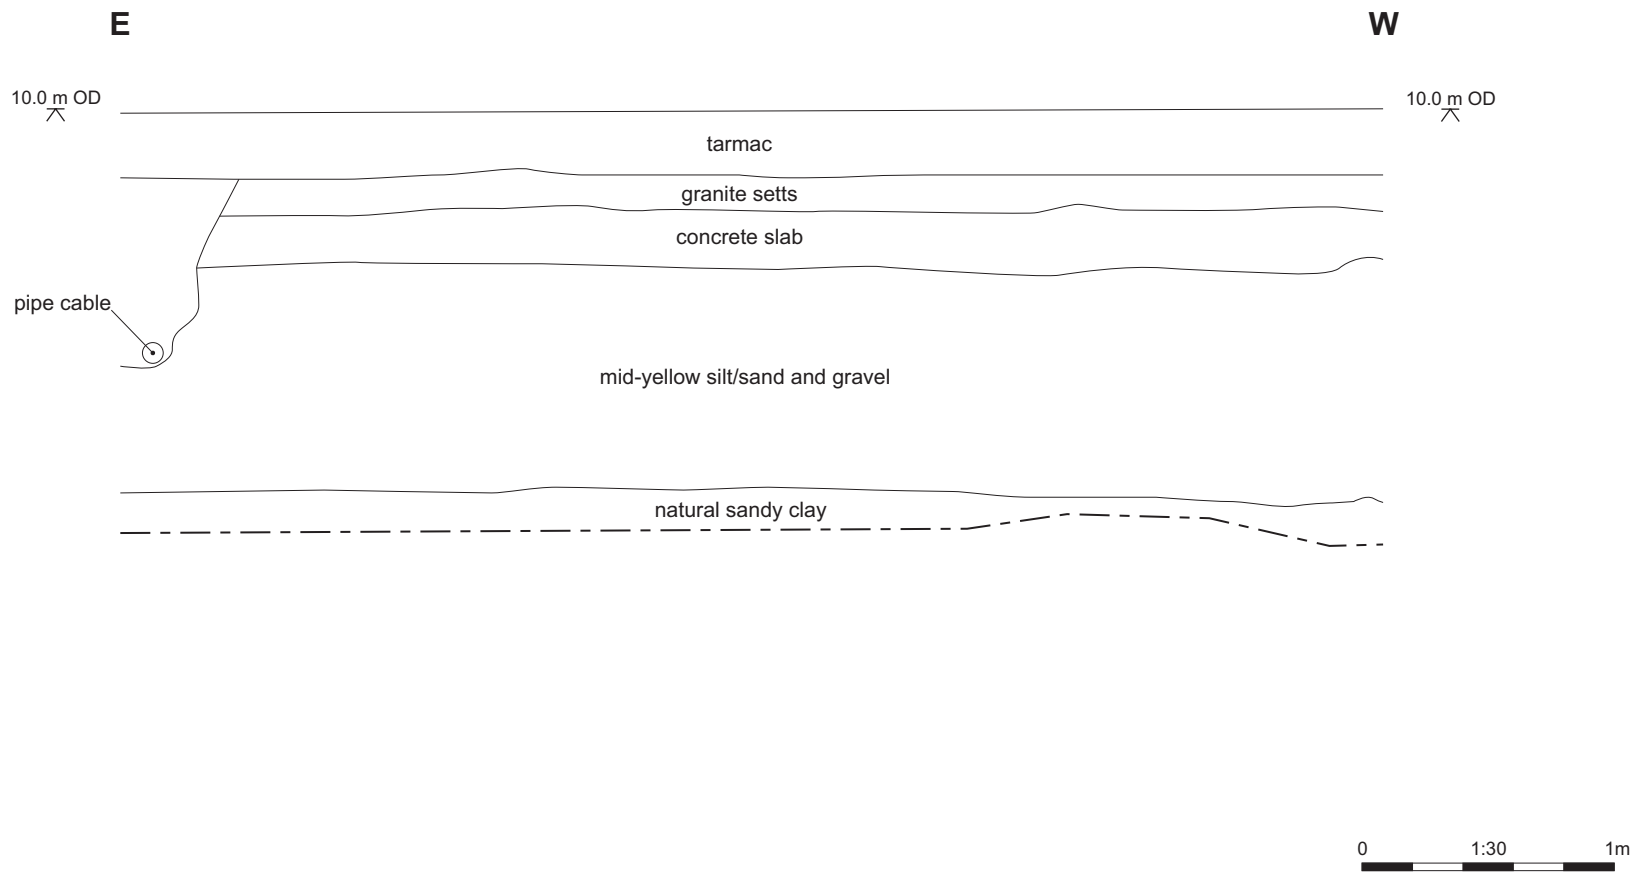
Leytonstone Road (Maryland station) north facing section 14
